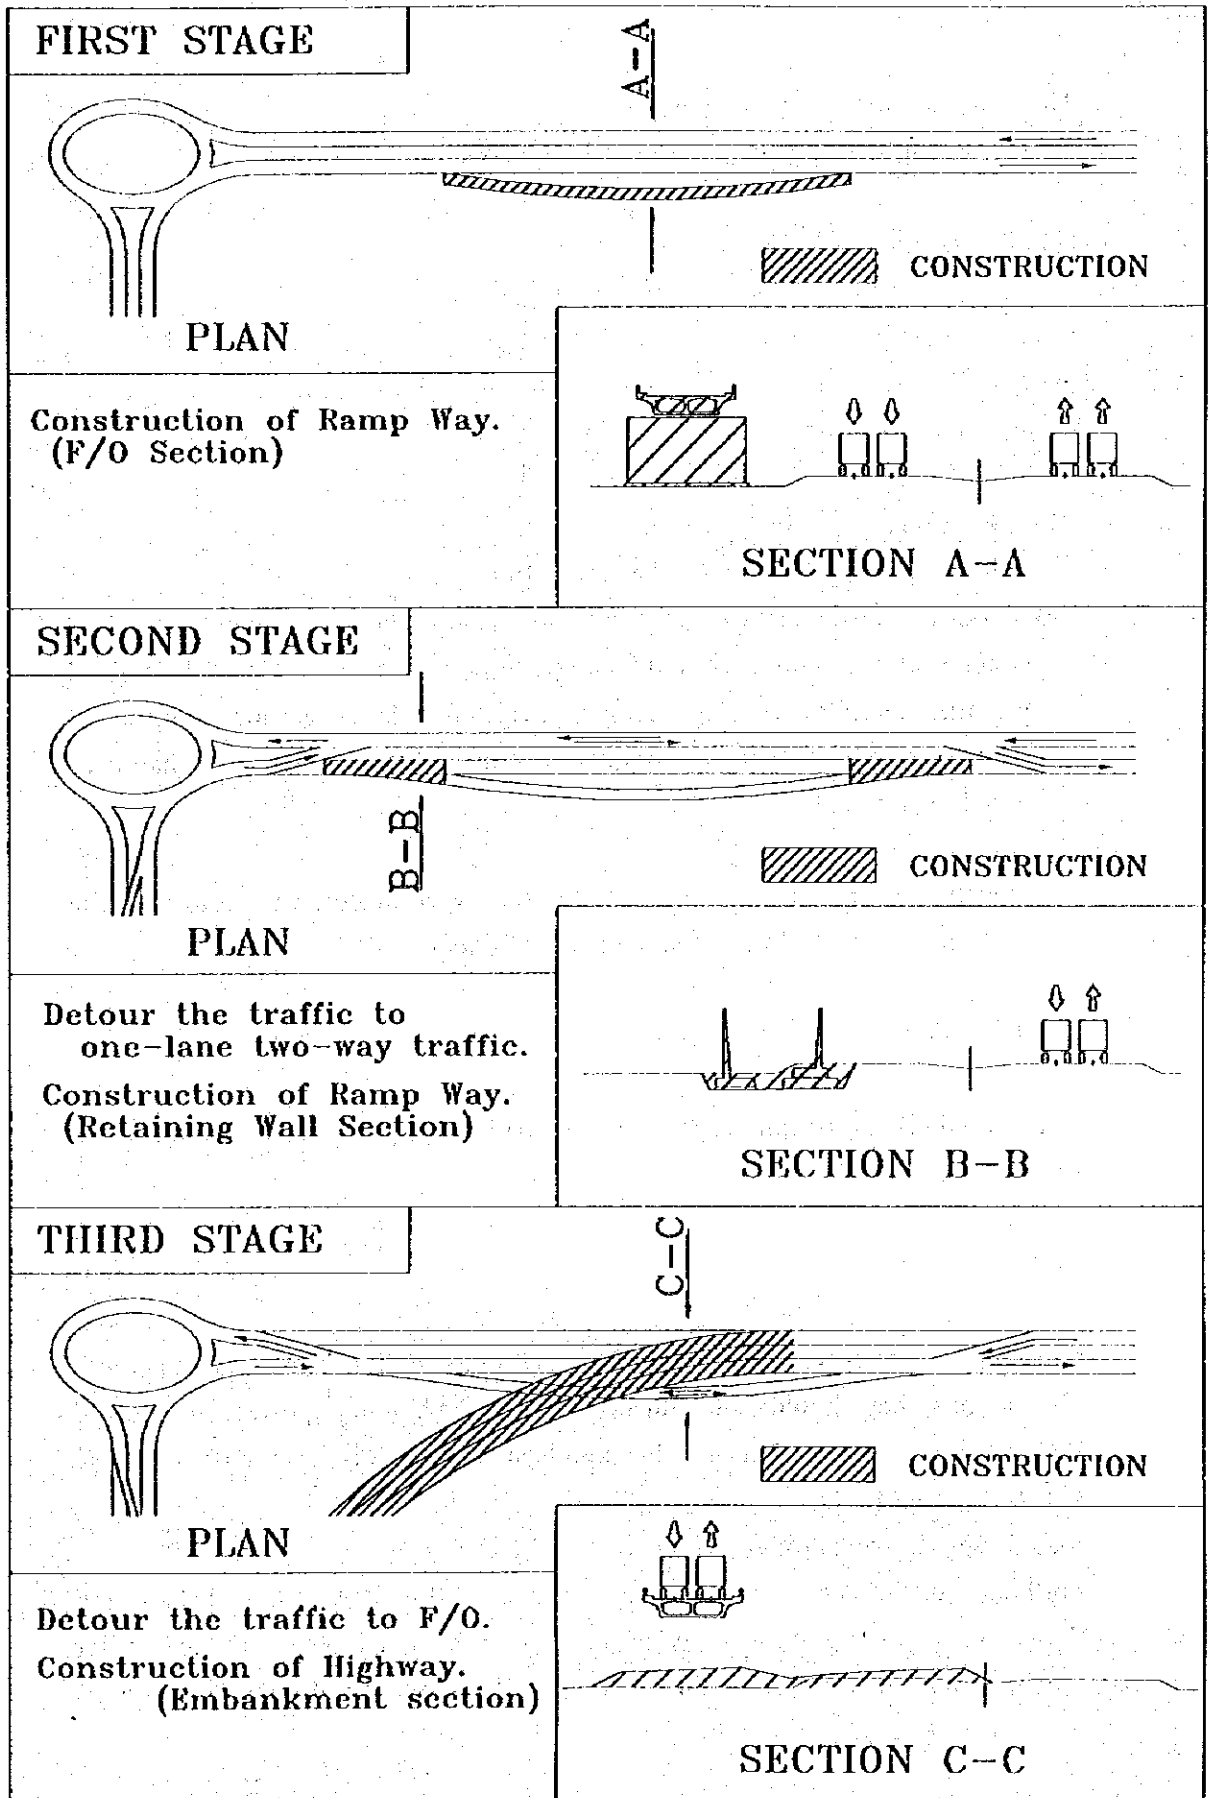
Construction Sequence and Detour Plan for Agr F/O Works
